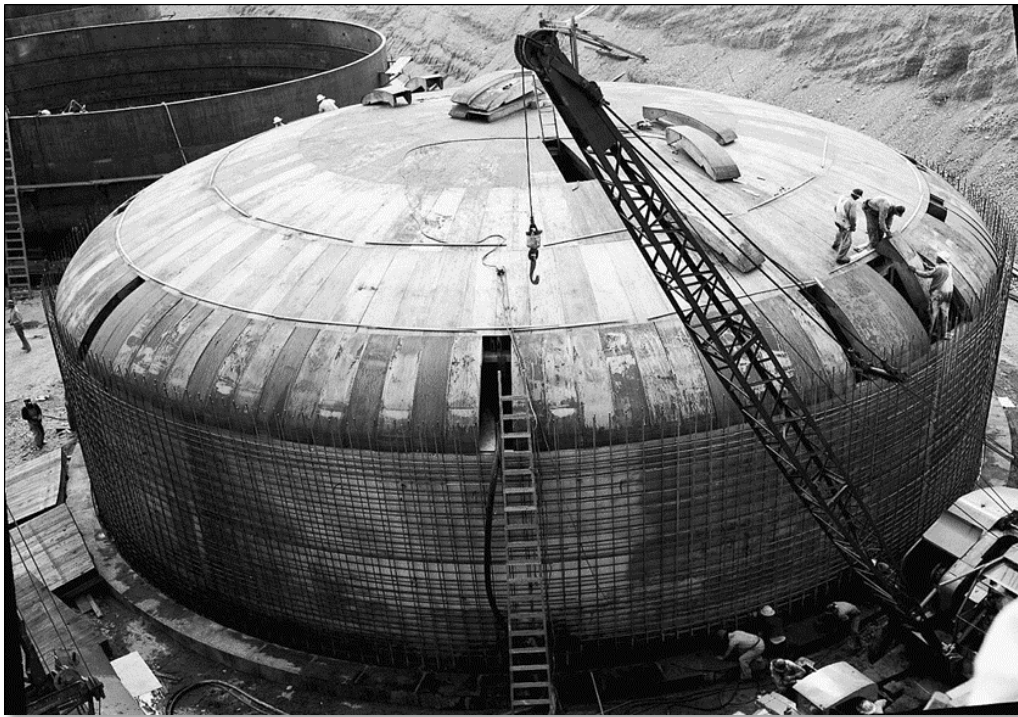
View of Wood Forms and Wall Reinforcing Steel (RPP-PLAN-61510)
